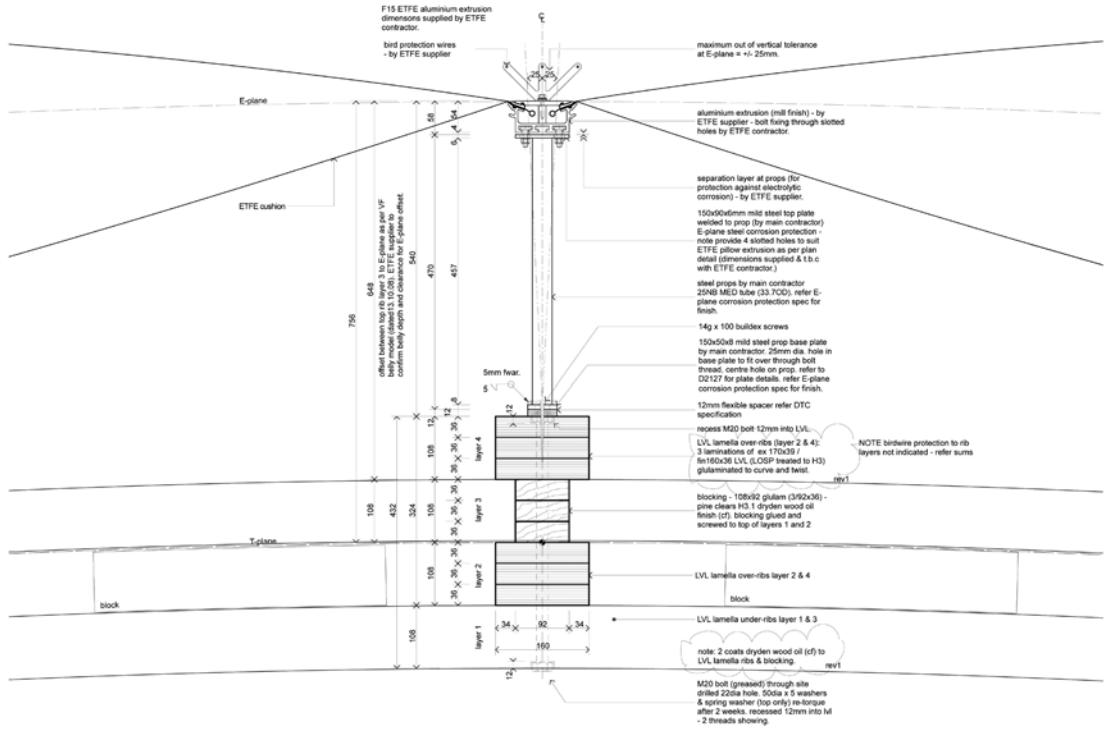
Section through the prefabricated upper rib showing intersection with lower rib and details of ETFE cushion support
